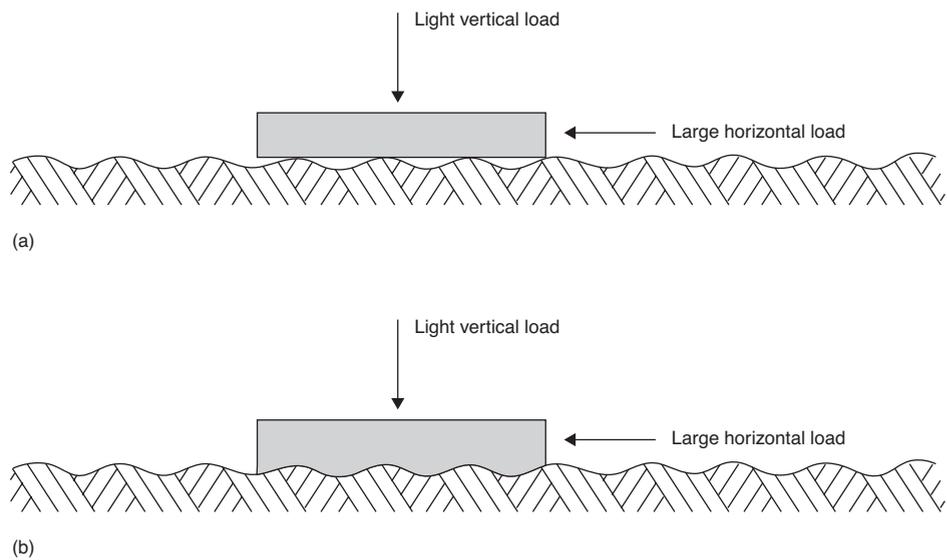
(a) Light precast footing subjected to horizontal load. (b) Cast-in-situ footing fitting intimately to the ground
